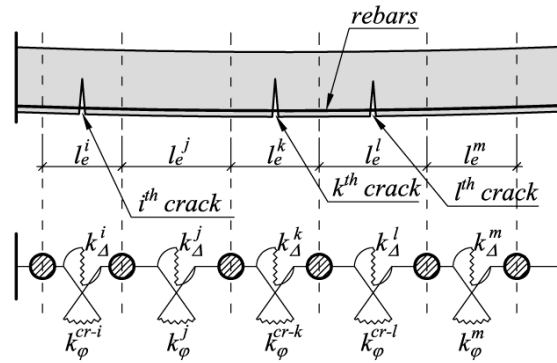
Scheme and numerical model of the reinforced concrete beam with cracks
